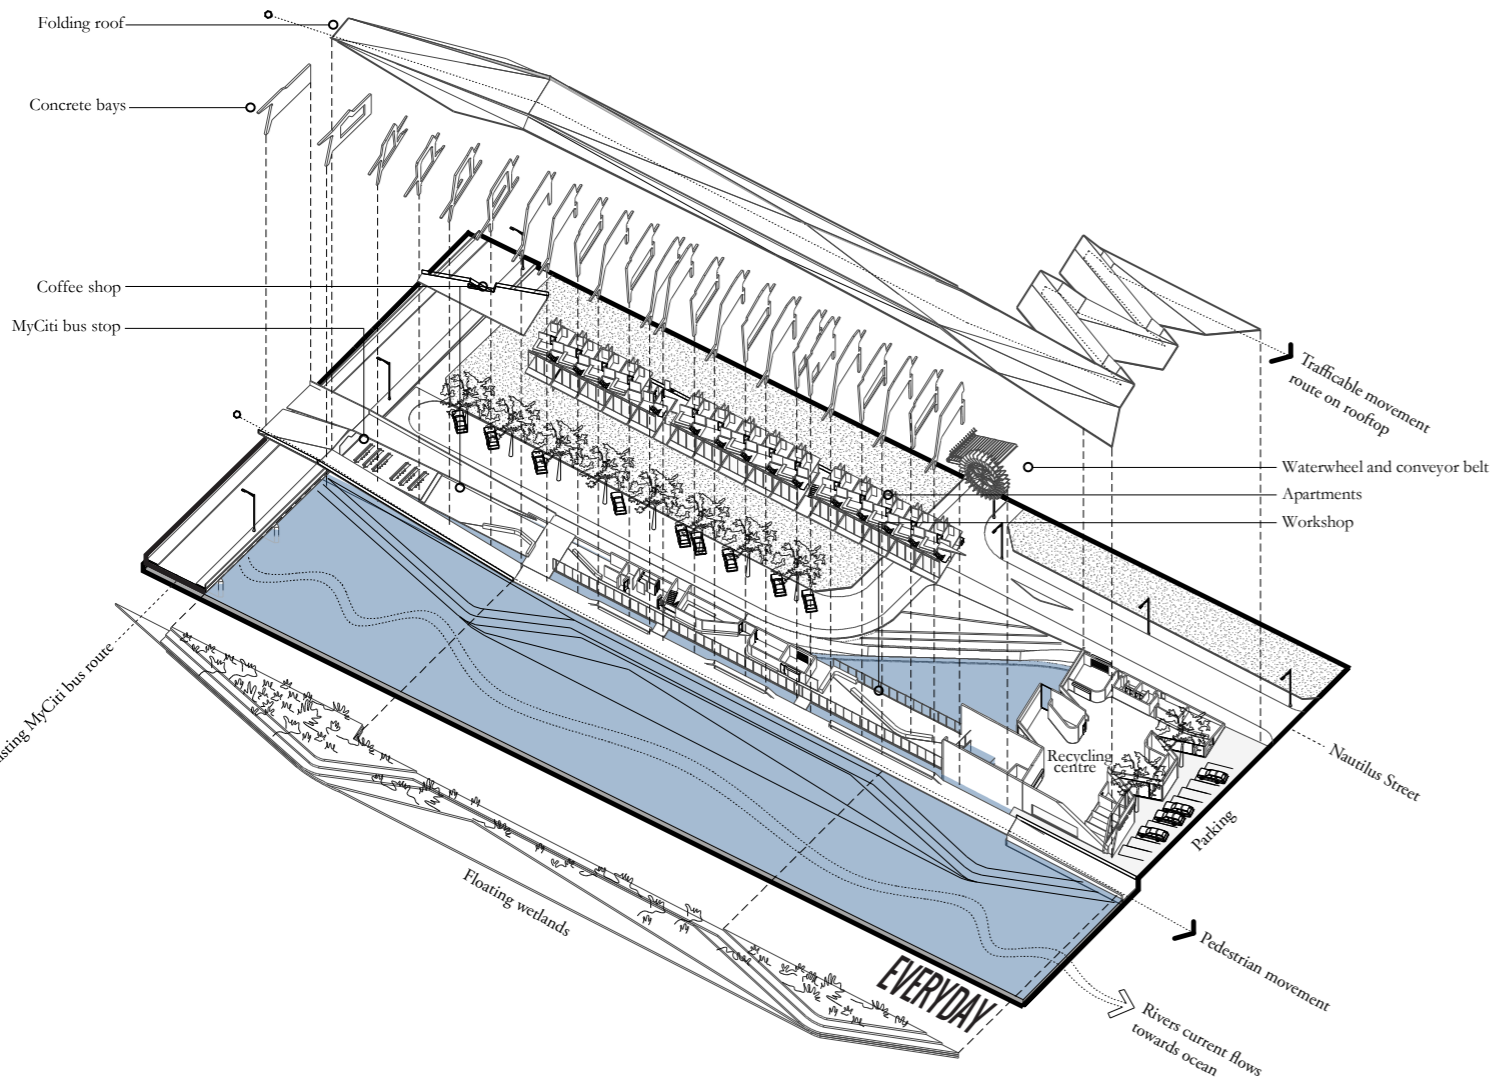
Exploded axonometric drawing of 'The Everyday'.
